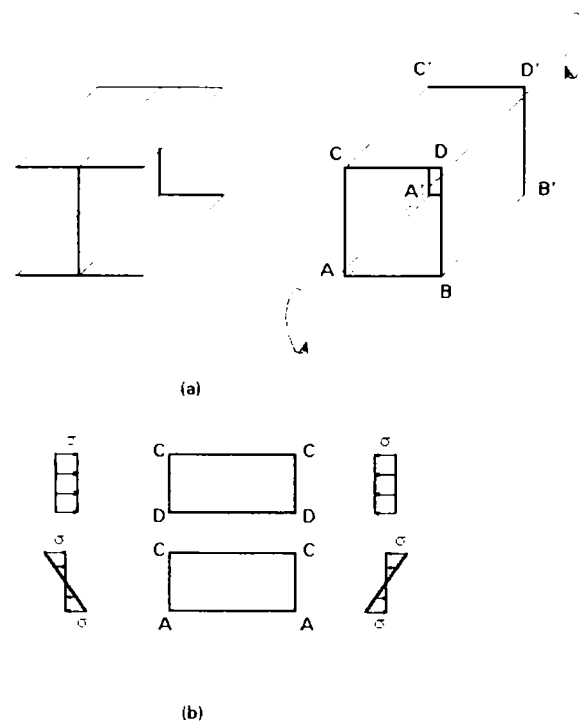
Typical sections (a) examples, (b) in-plane stress conditions for box girder subpanels
